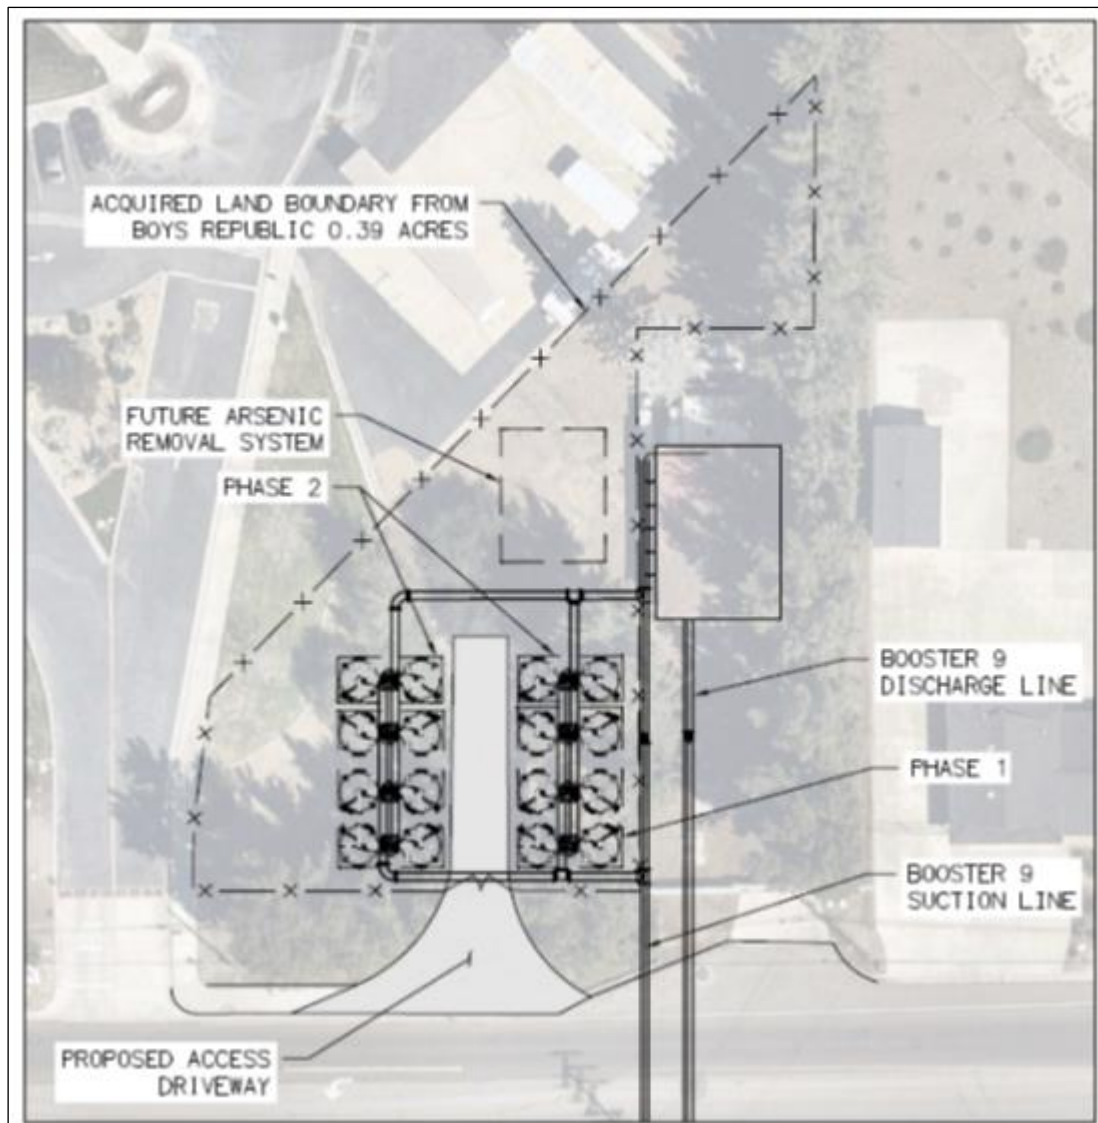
PRELIMINARY DESIGN – FACILITY PLAN
